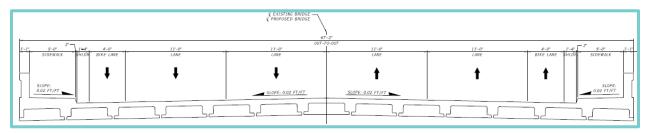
Urban Typical Section, Florida Slab Beam (CIP Continuous Slab Similar)
